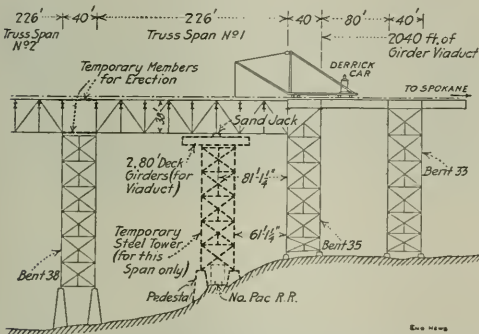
TEMPORARY TOWER USED TO SUPPORT THE FIRST HALF OF THE FIRST TRUSS SPAN
